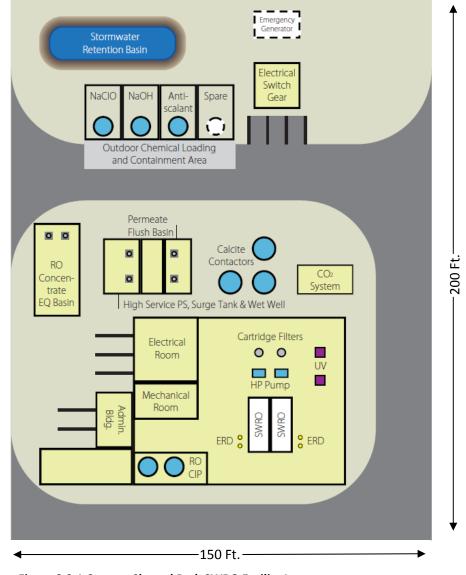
Shamel Park SWRO Facility Layout
